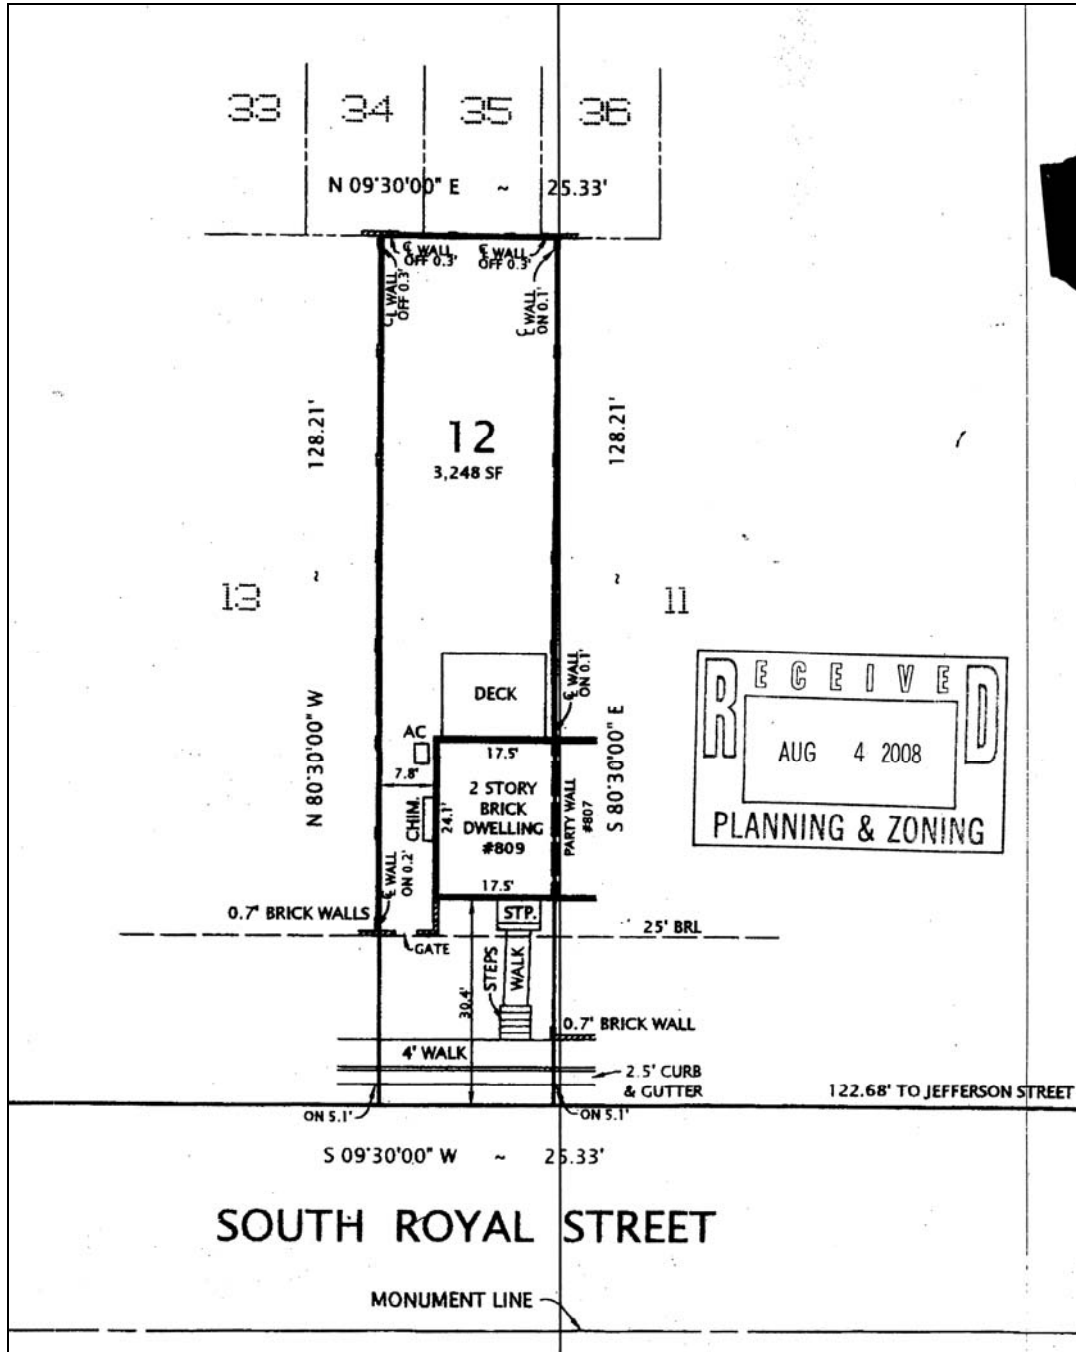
Plat of 809 South Royal Street, showing location of brick retaining wall on adjacent property.
